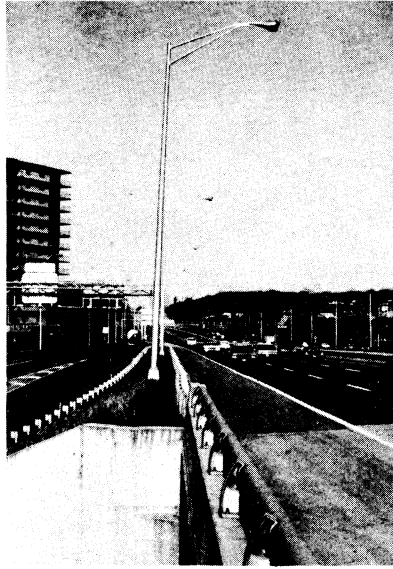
Typical view of luminaires on Rte. I-95, looking north from the Glebe Road interchange area.
